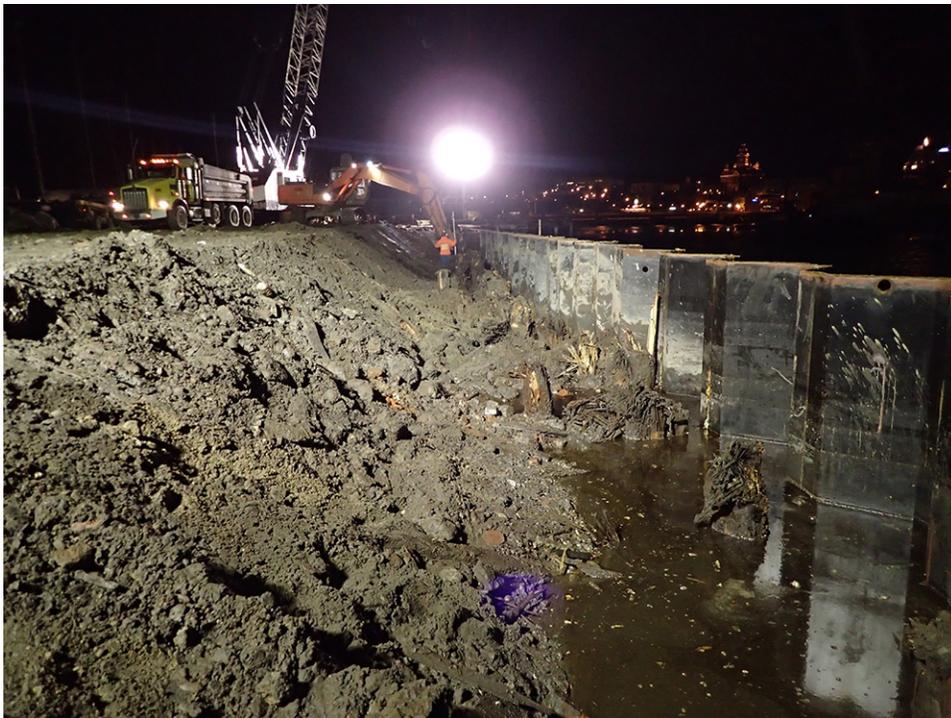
Central Waterfront sheetpile installation: West Central Waterfront Wall. Facing west.
